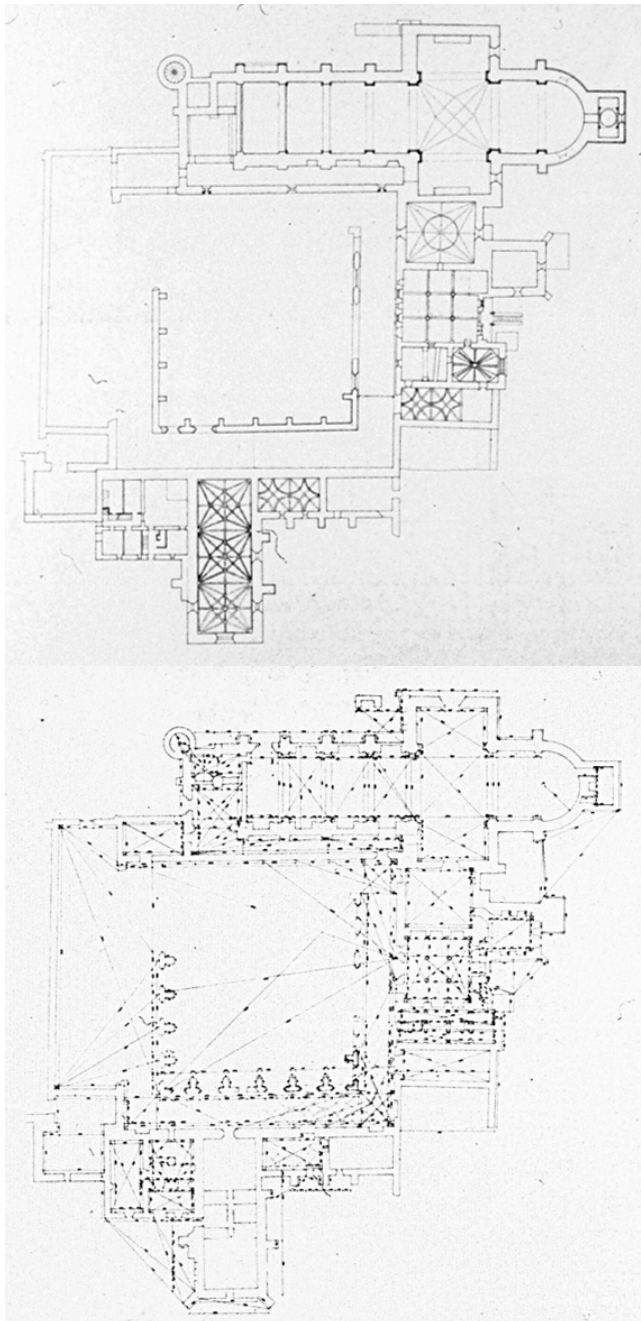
Ground plan survey facing downwards and facing the vaults. Santa María de Carracedo Monastery. Plans by Salvador Pérez Arroyo and Susana Mora, 1990.
